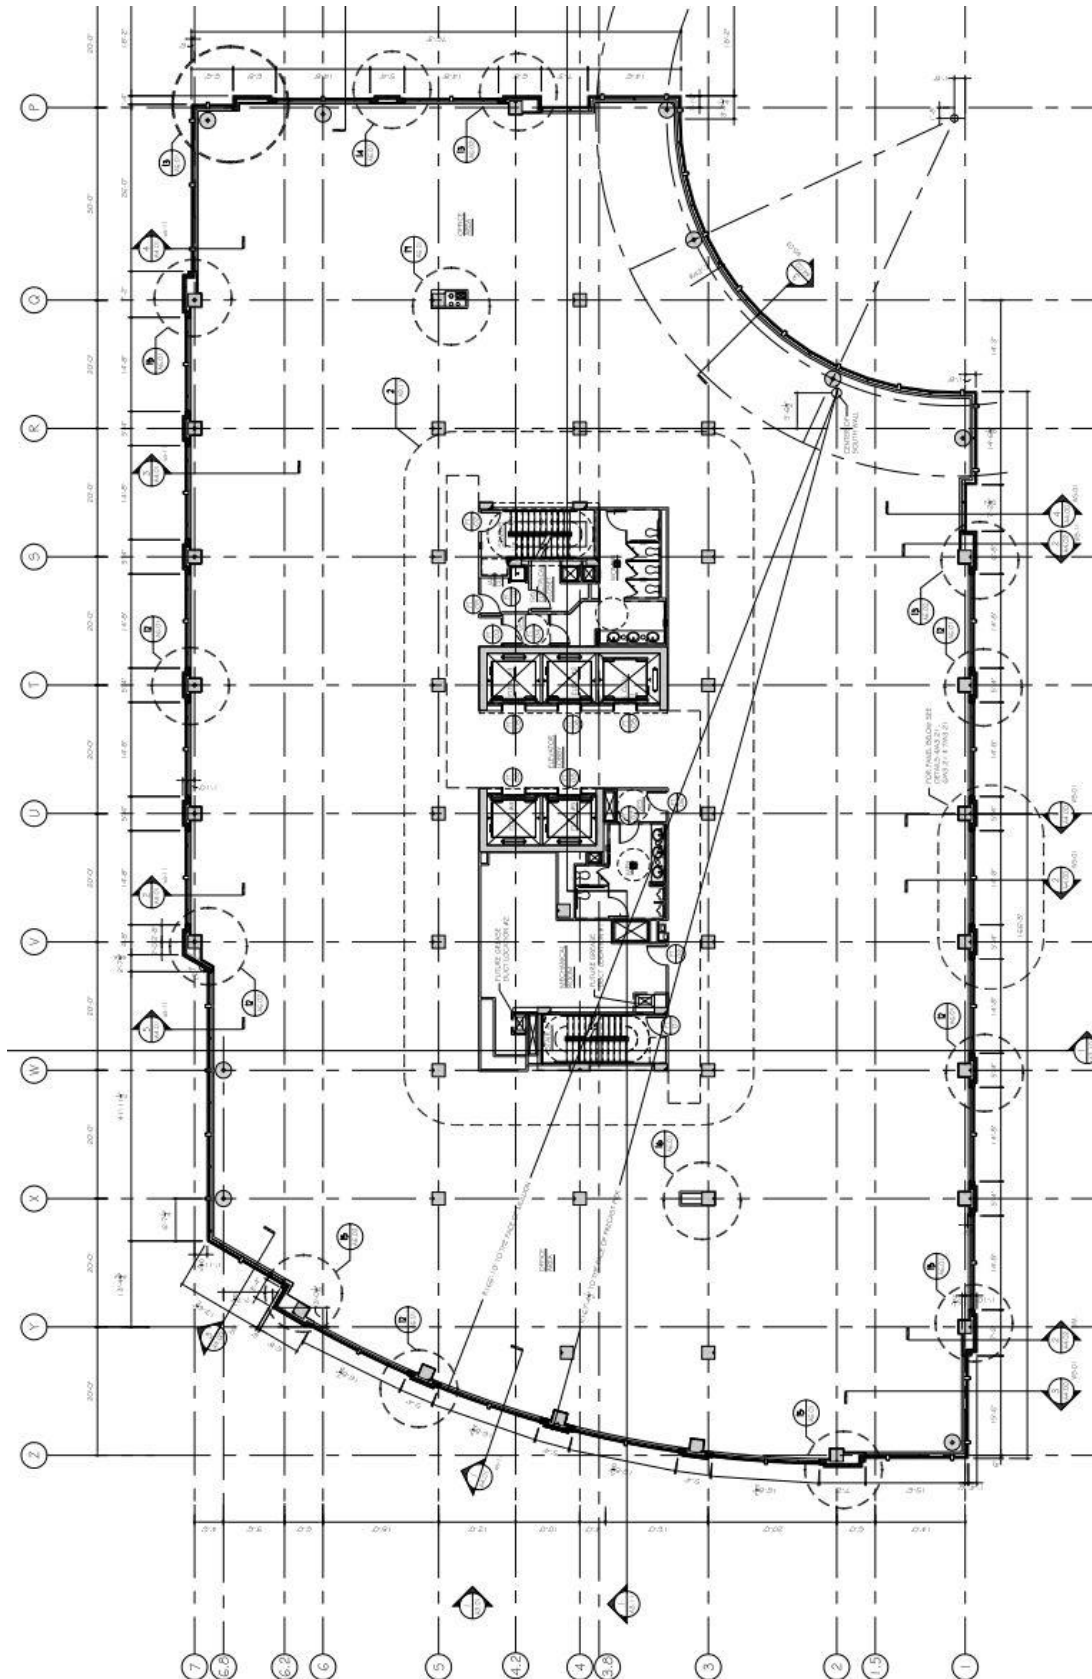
Typical Office Floor Plan – A2.19 of Construction Documents
